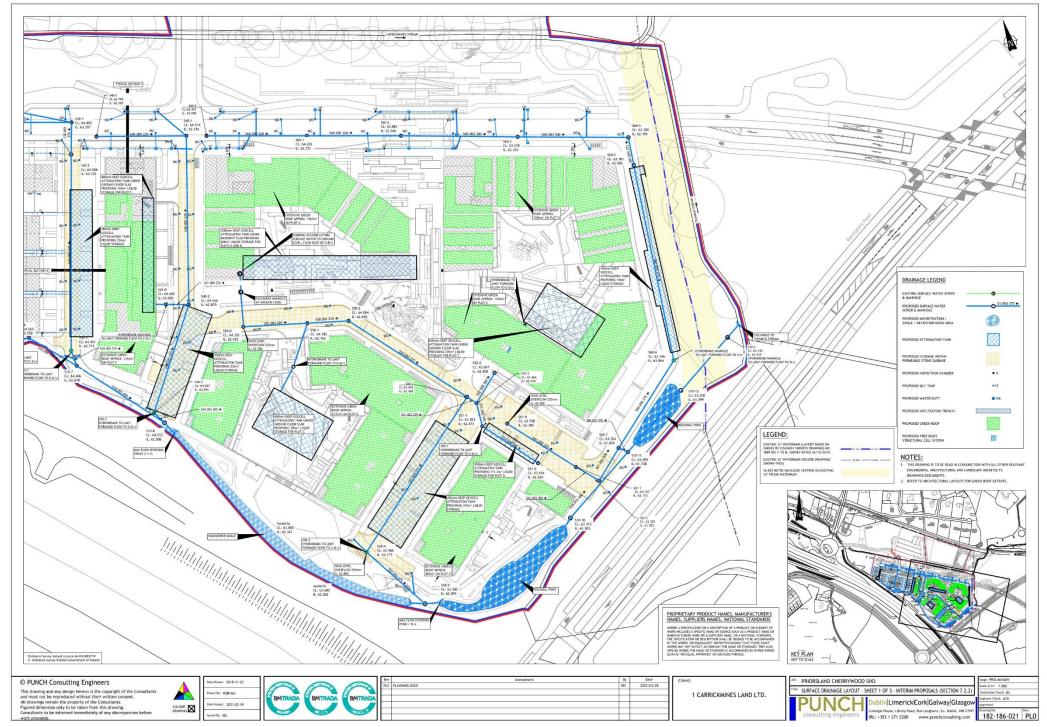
Surface water drainage – Interim Proposal (sheet 1)
